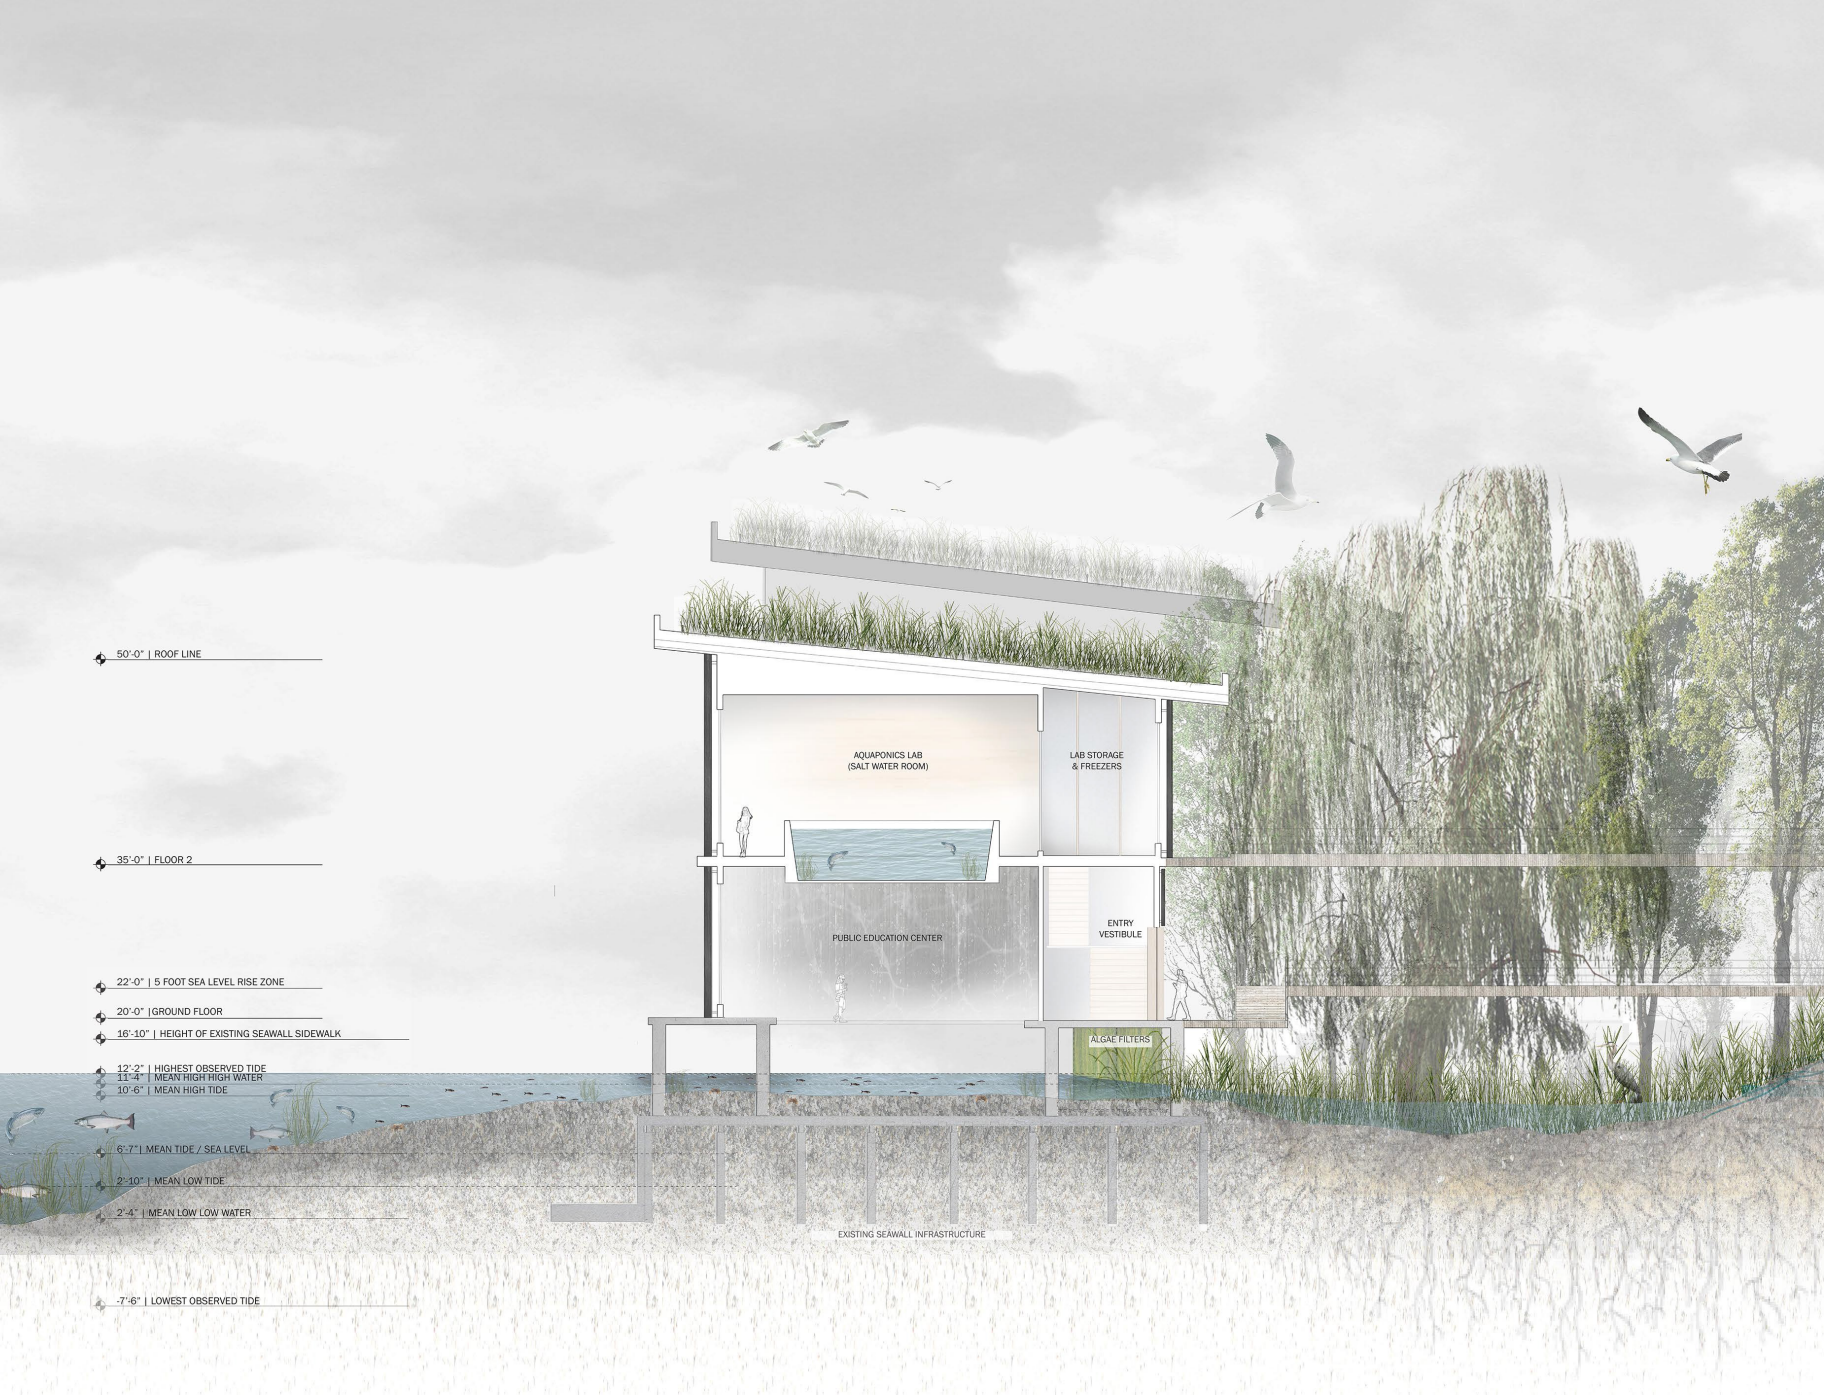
Cross Section of the Fresh Water and Salt Water Building from Western Avenue to Elliott Bay.
